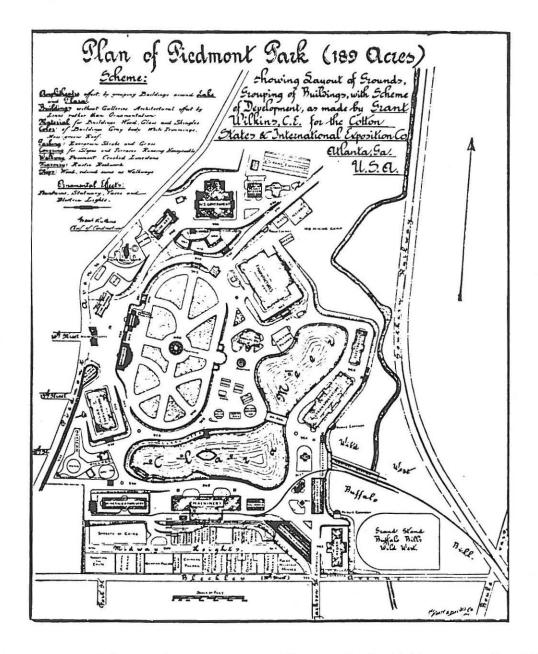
Plan Showing Location of Buildings and Other Attractions of the Exposition in Piedmont Park
